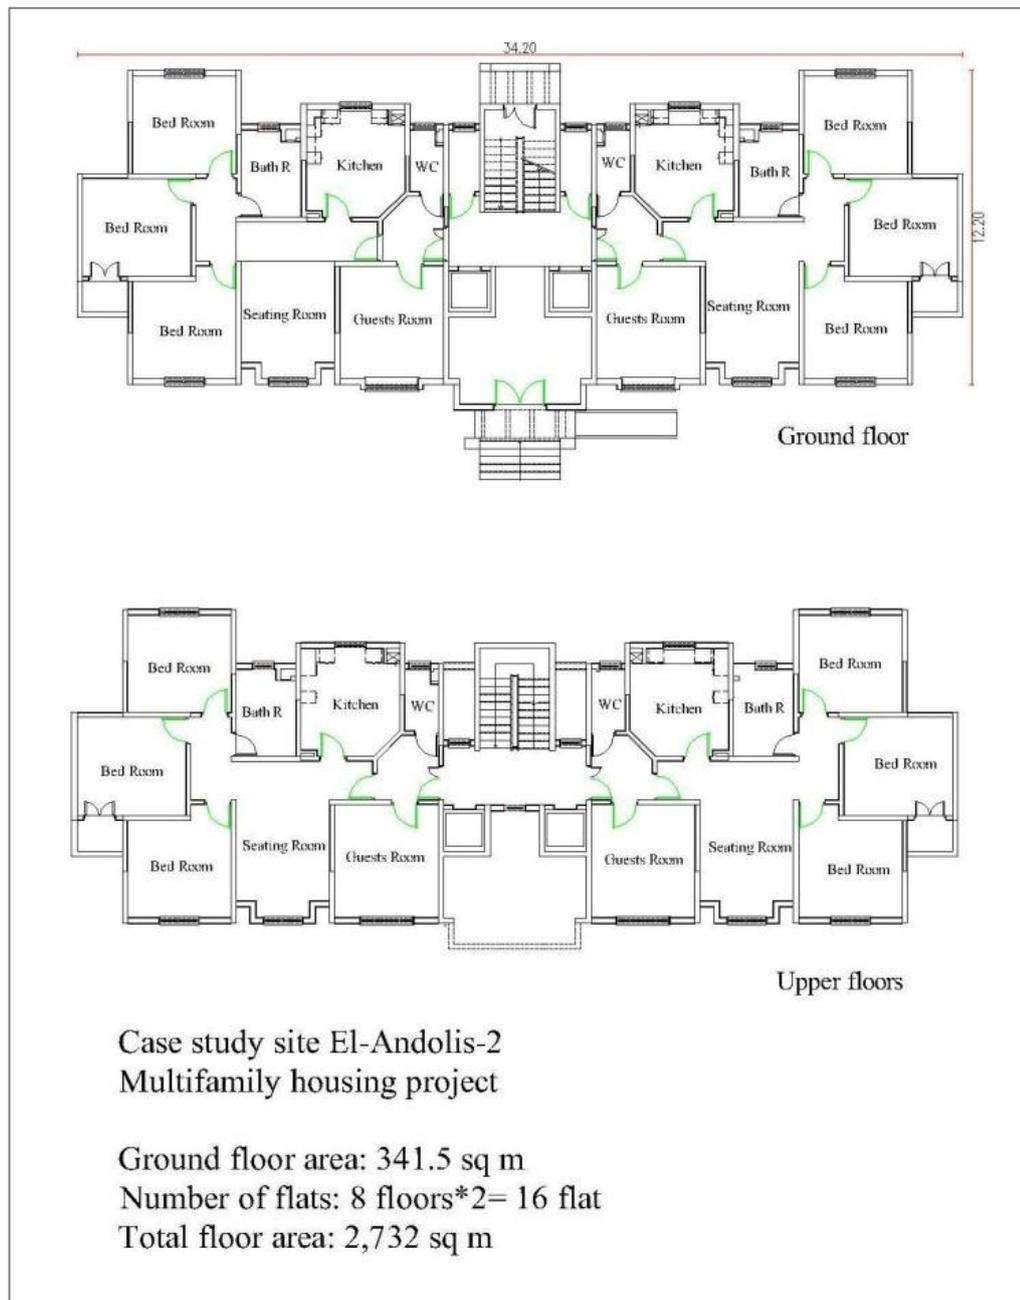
33: Architectural Plans, Site Ten - El Andolis-II Area
